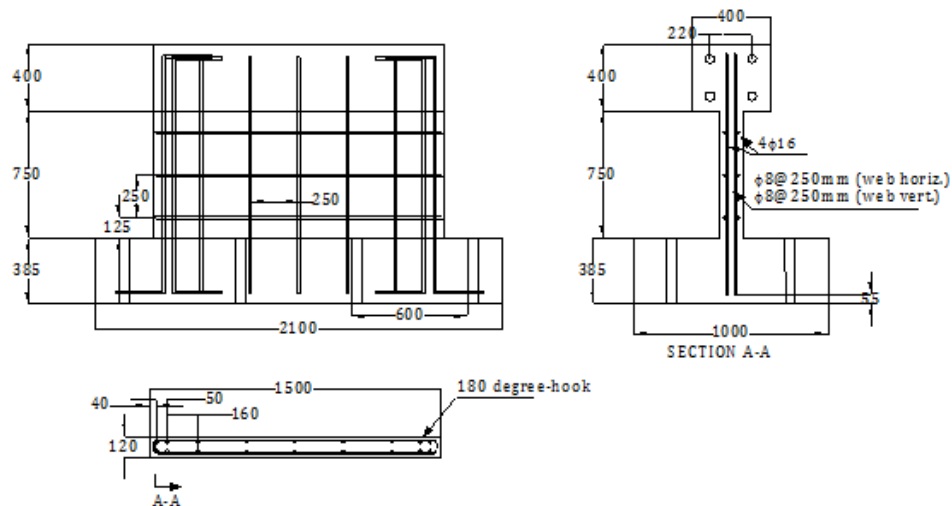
Geometry and Wall Reinforcement of Specimen T1-S1 (Terzioglu, 2011).
